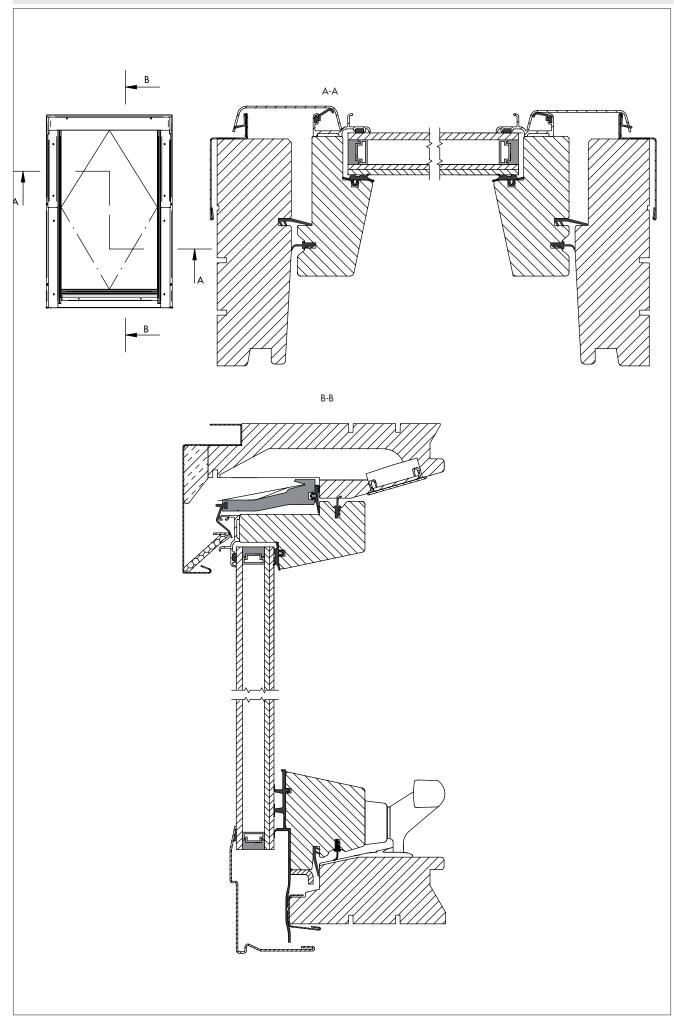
FTS-V U2 Centre Pivot Roof Window cross-sections
